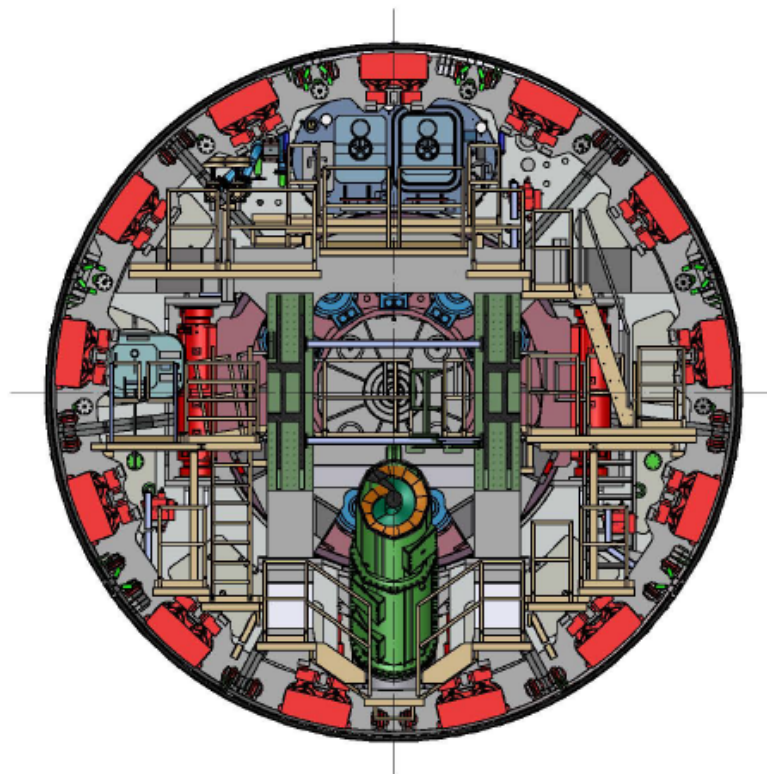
EPB TBM Thrust Cylinders (S-1014, Drawing 4873-000-001-00).
